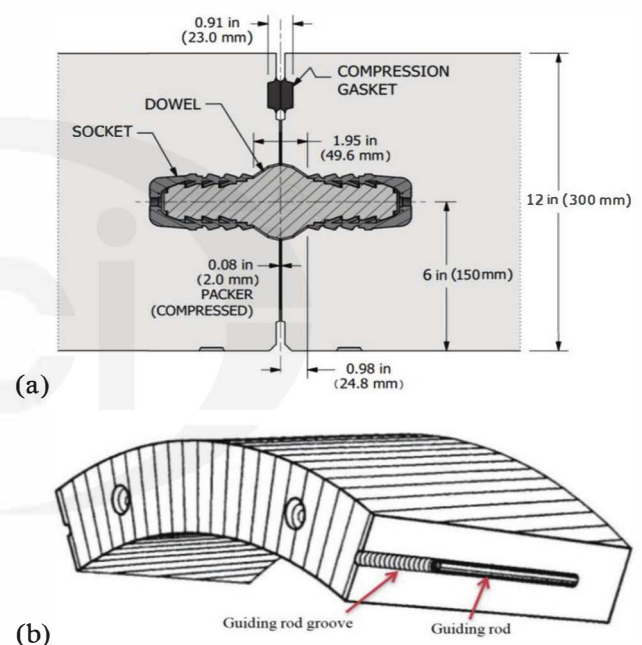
(a) Typical dowel connection in circumferential joints; and (b) location of guiding rod groove and guiding rod (ÖVBB 2011).
